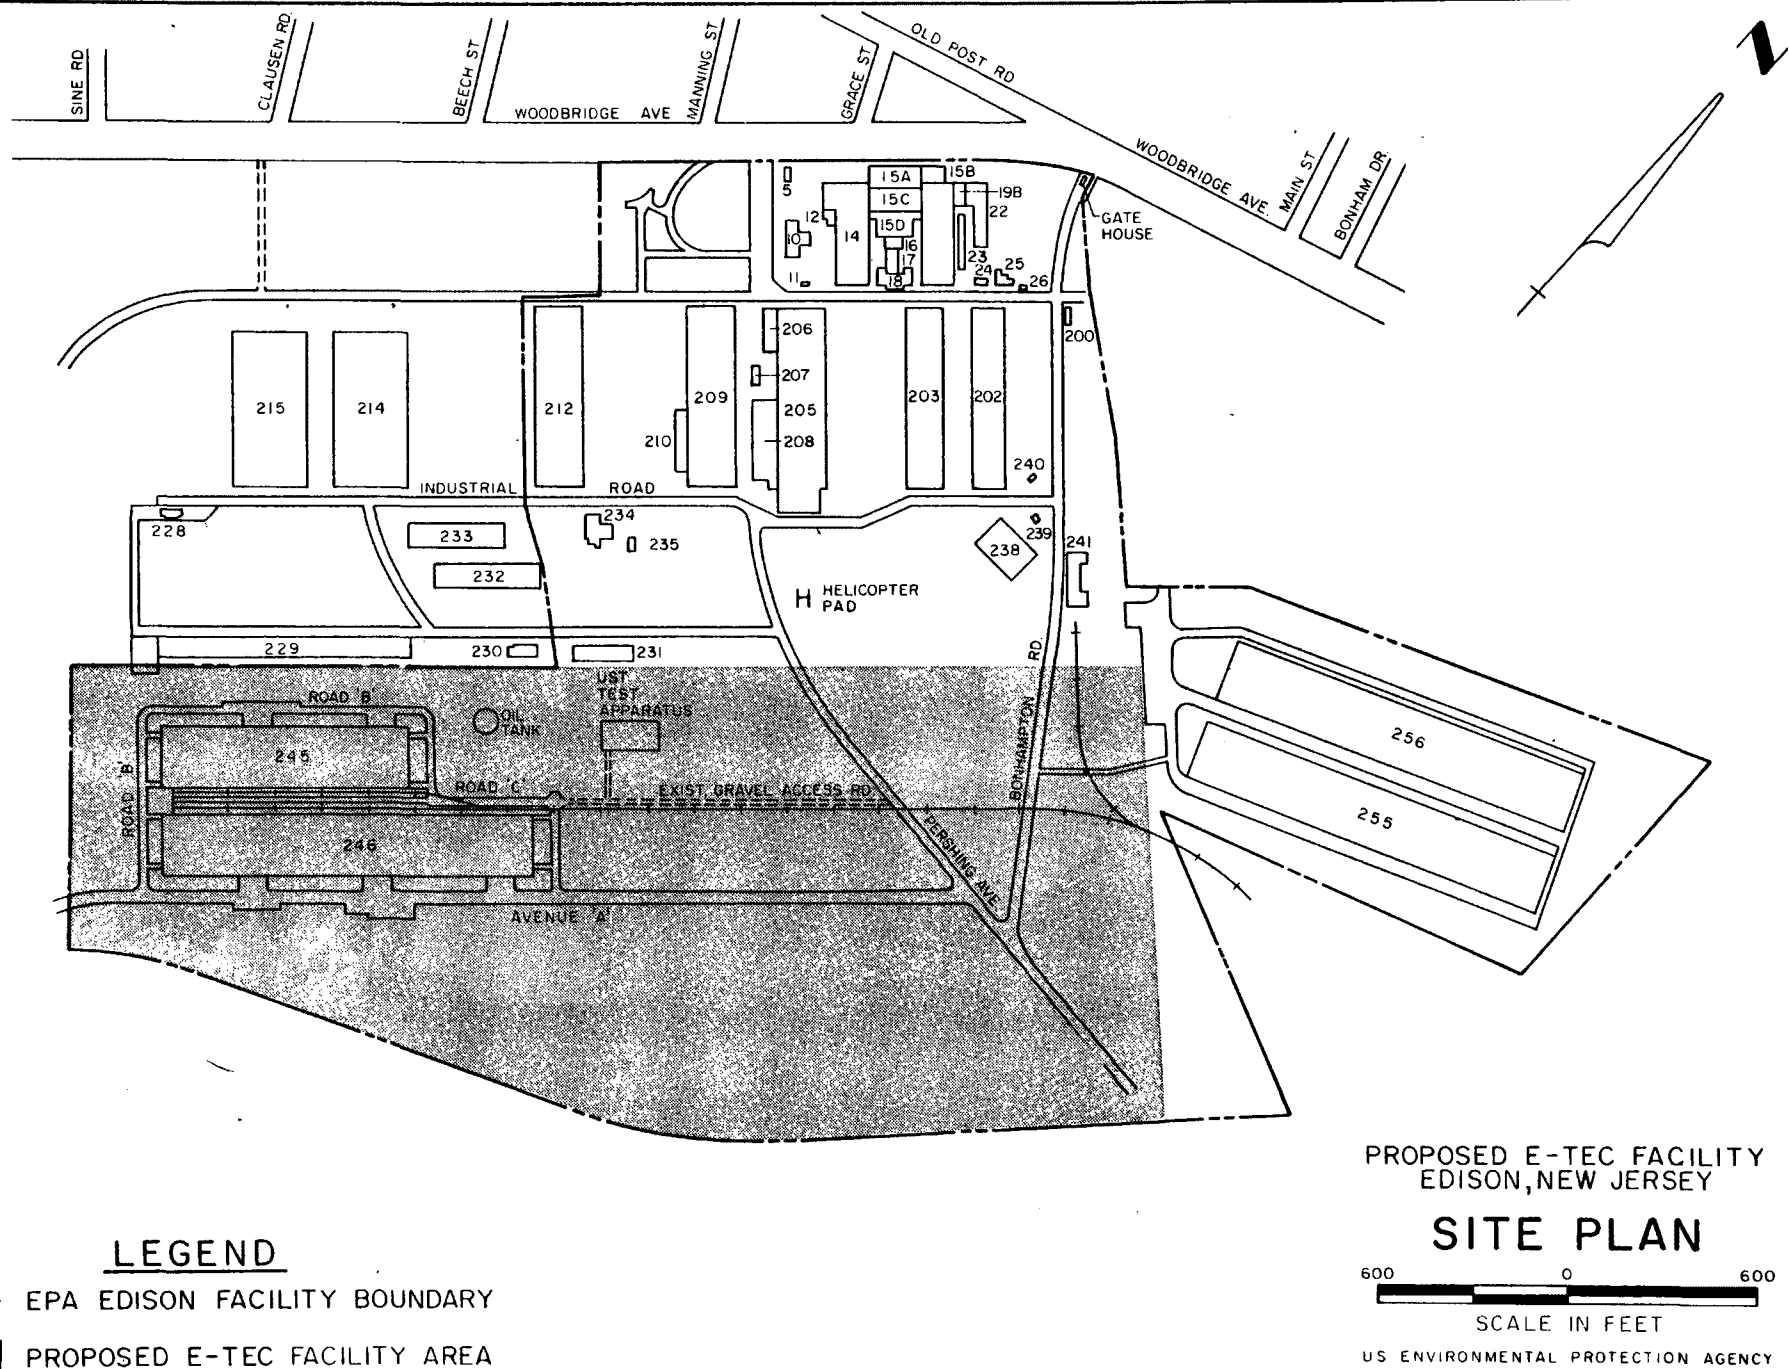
, shows the layout of the existing Raritan Depot site with the proposed 110-acre E-TEC facility site highlighted.
